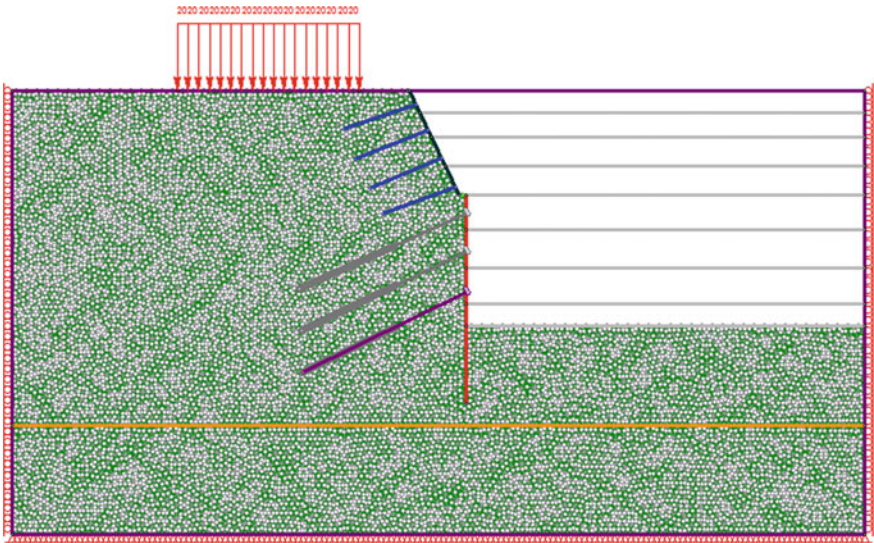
Section at maximum Excavations depth (Excavation 18 m)
